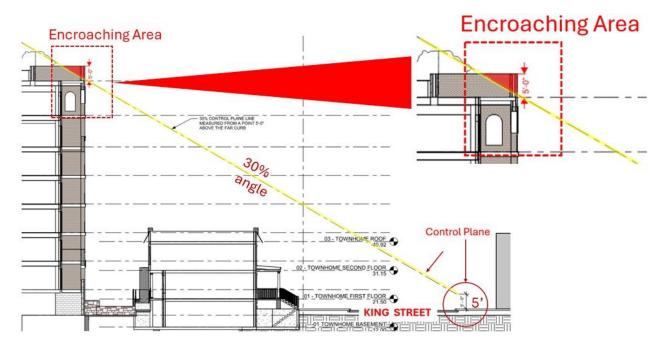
Portion (in red) of the new building that does not comply with the recommended 30-degree building envelope starting from King Street
